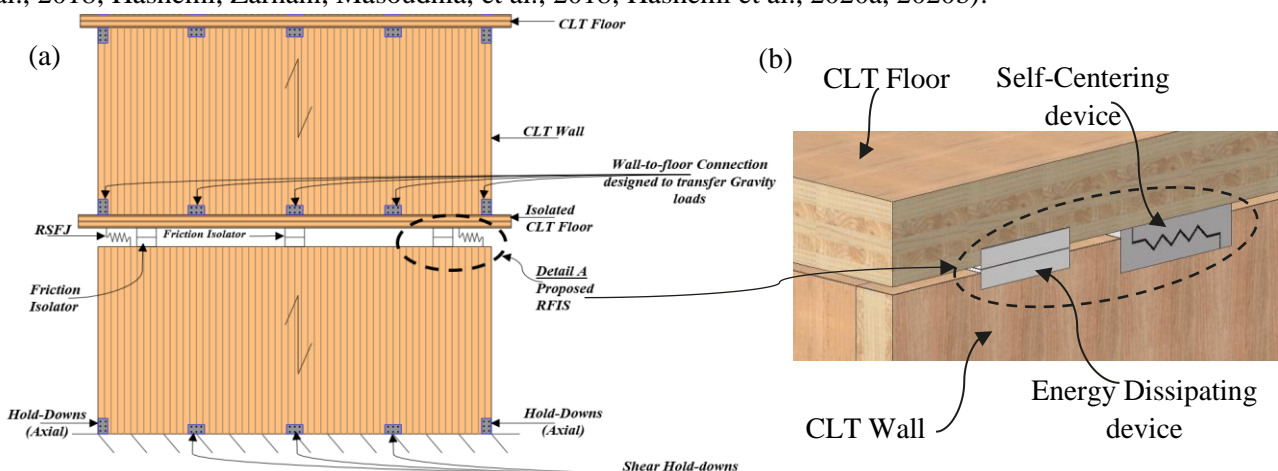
Proposed RFIS: (a) 2D schematic, and (b) Connection between CLT floor and wall
